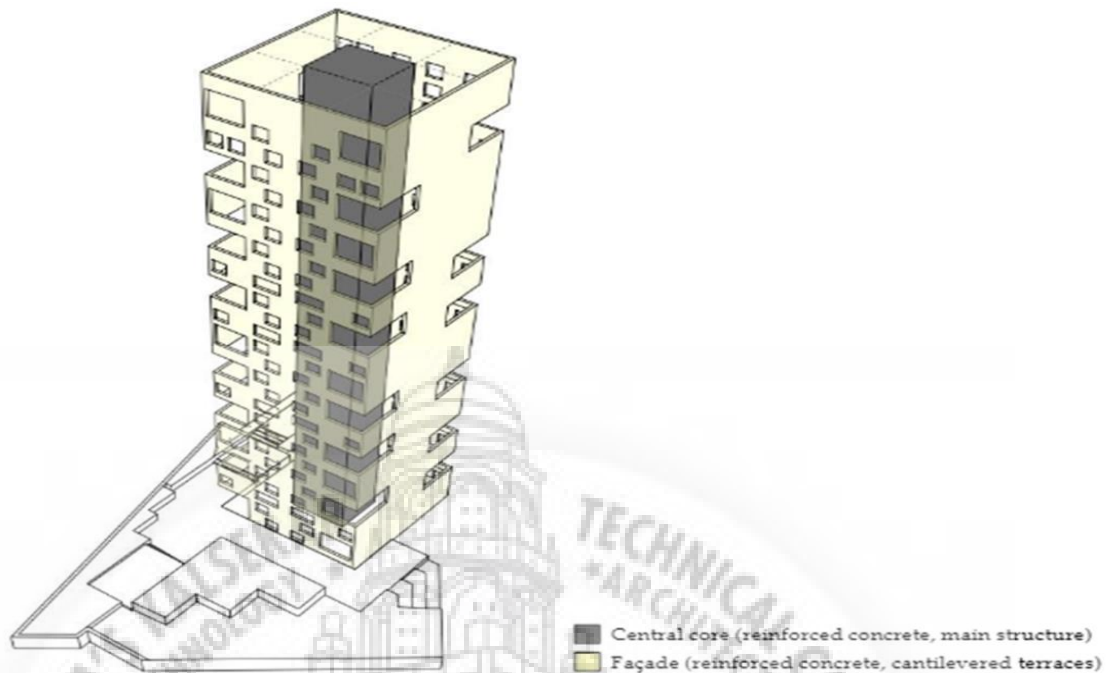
Structural system Kanchenjunga Apartment (Source- issuu)
